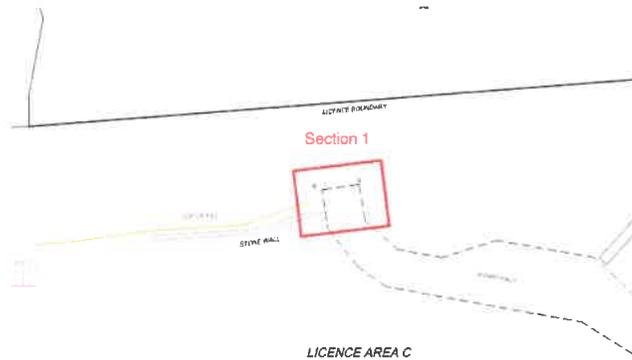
Location of boardwalk section 1 (see Appendix B for Land Survey)
